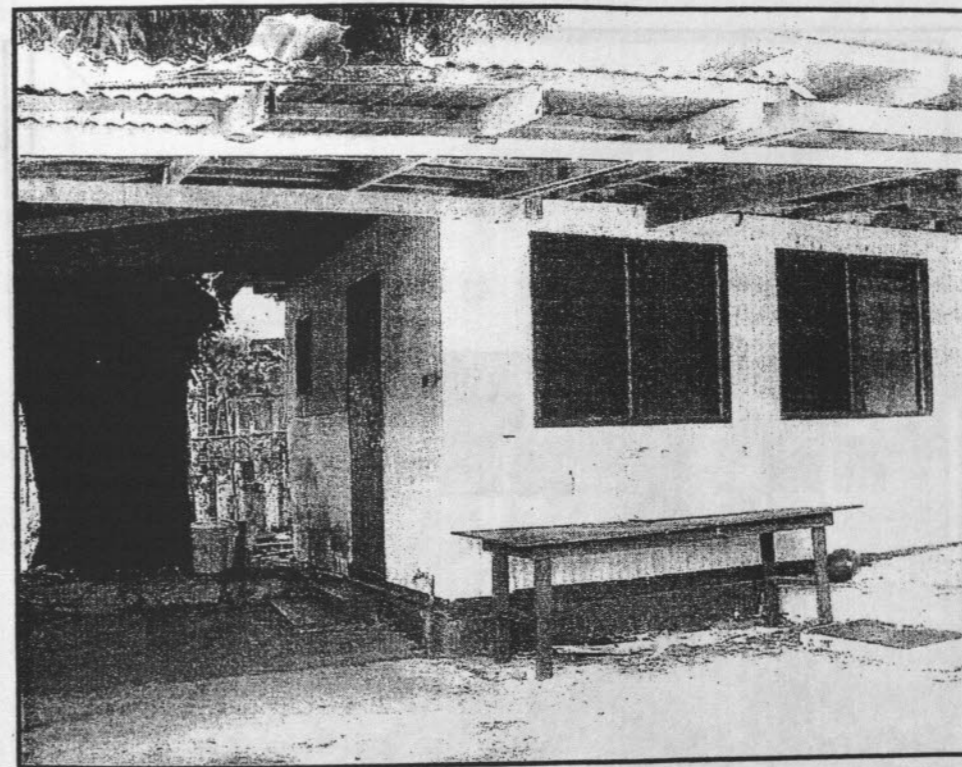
Agat: wood frame house with tin roof and walls and glass louvered windows; roofed space extends from side of house (to left).
